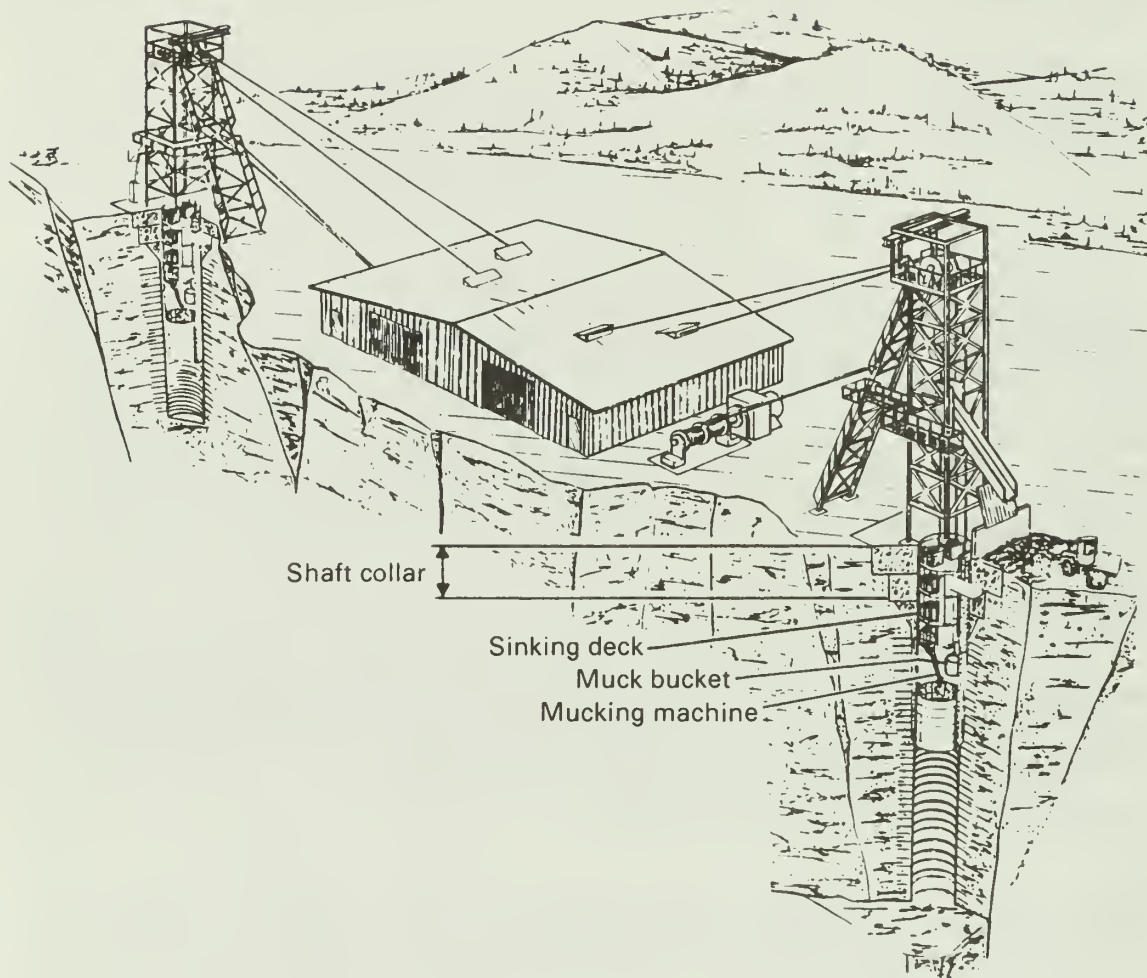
Drawing (not to scale) of a typical hoist, headframe, and collar for an exploratory shaft.
